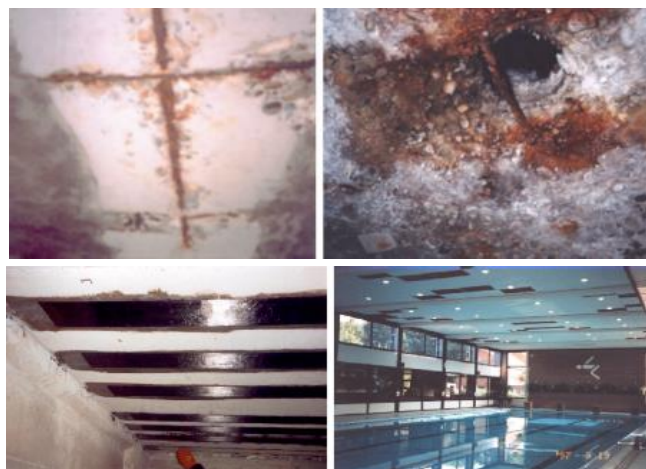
Concrete damage on roof slab of a swimming pool and end result of CFRP strengthening.
